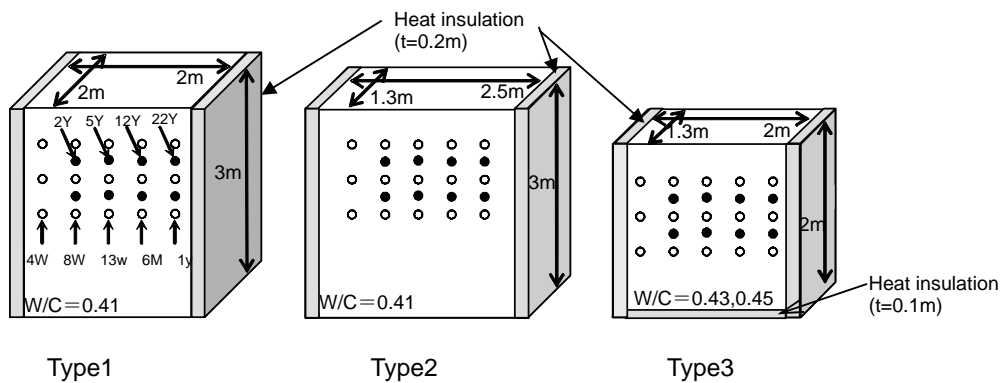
Configuration of Concrete Specimens and Coring Locations
